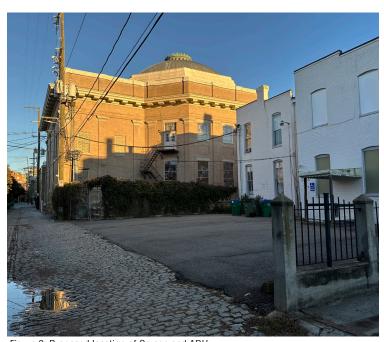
Proposed location of Garage and ADU seen from alleyway behind W Franklin St
